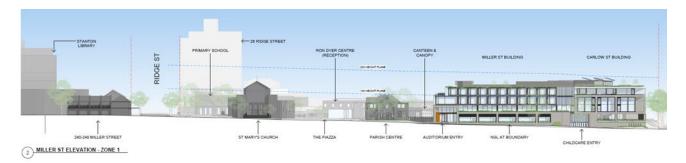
Originally proposed Miller Street extended streetscape elevation - south
